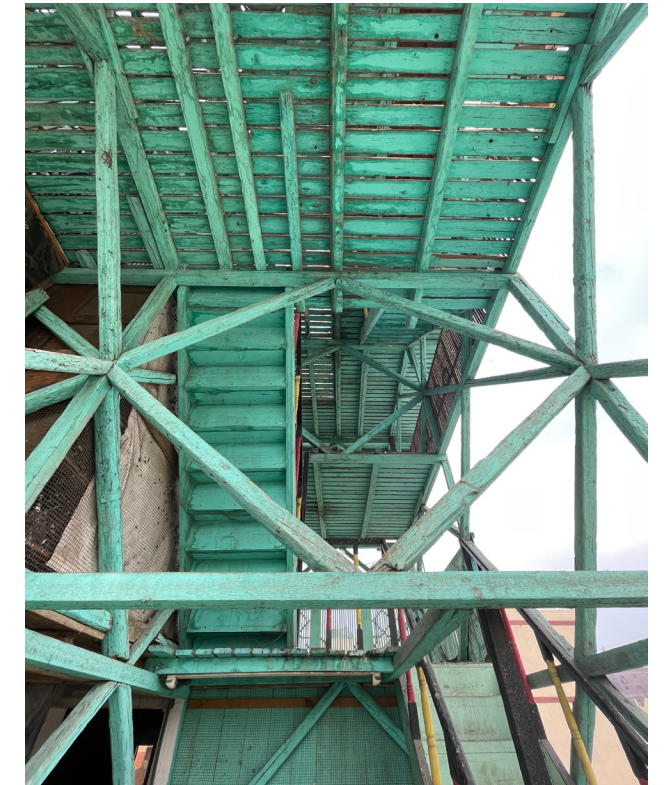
Pigeon Tower staircase with bracing structure. Wood painted in blue.
